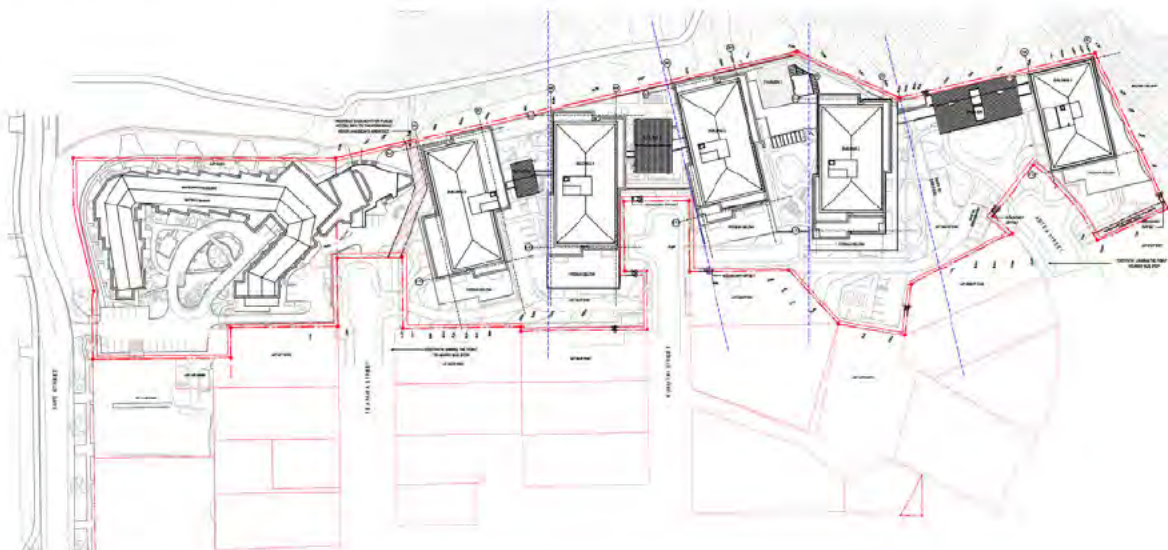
Extract of Podium Level General Arrangement Plan (Warren & Mahoney Architects, 2025)
